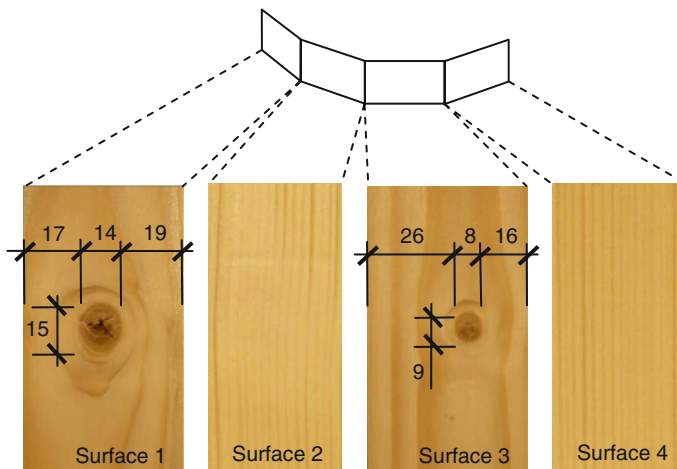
Knot dimensions (mm) in Centric knot specimen
